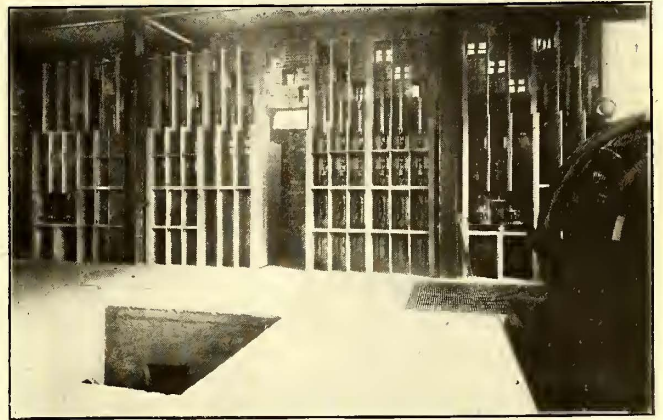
FRONT OF HIGH-TENSION BUS STRUCTURE, THIS VIEW BEING TAKEN BEFORE INSTALLATION OF THE THREE-COMPARTMENT-WIDE DOORS
